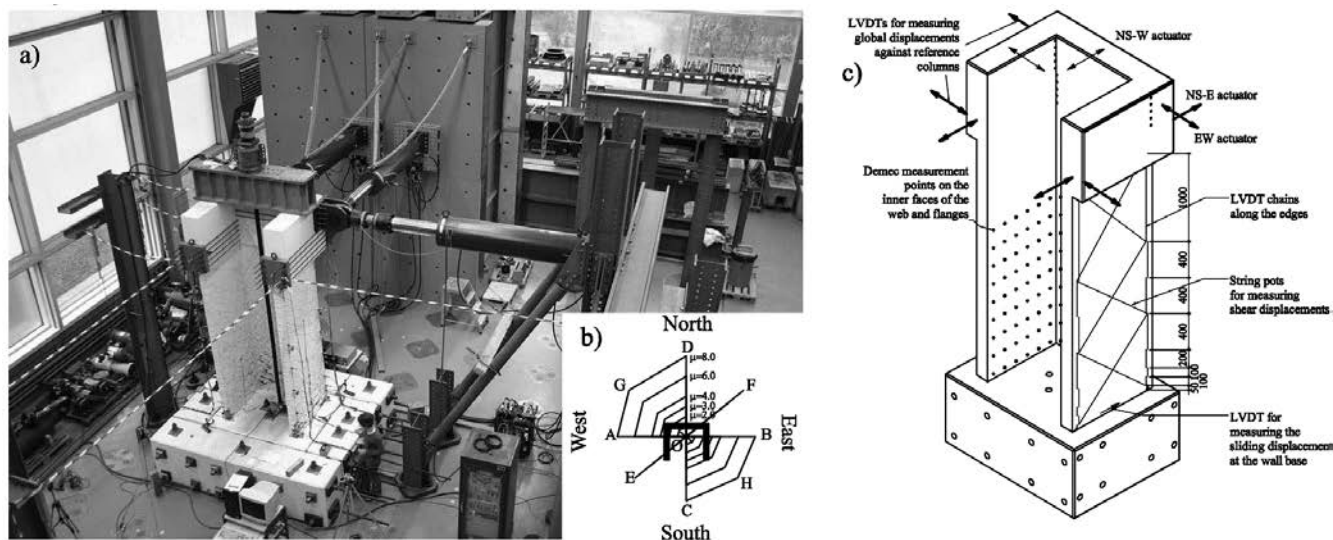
Quasi-static cyclic tests on U-shaped walls at the ETH: Photo of the test setup (a), bi-directional loading history (b) and instrumentation of the test units (c) (Beyer et al., 2008)
